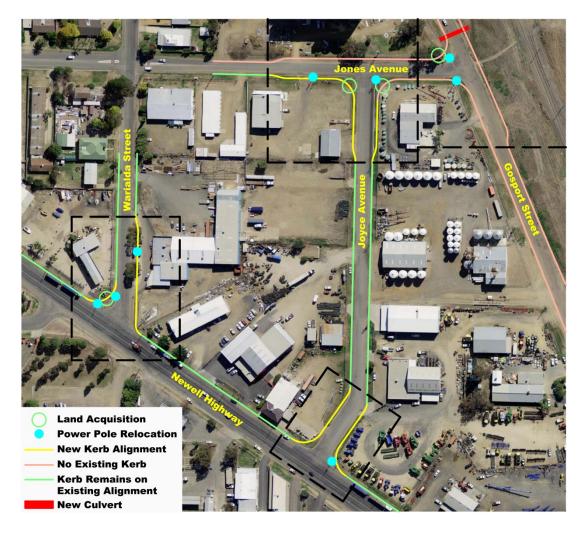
Upgrade Plan for B-Triples, AB-Triples and A-Doubles
